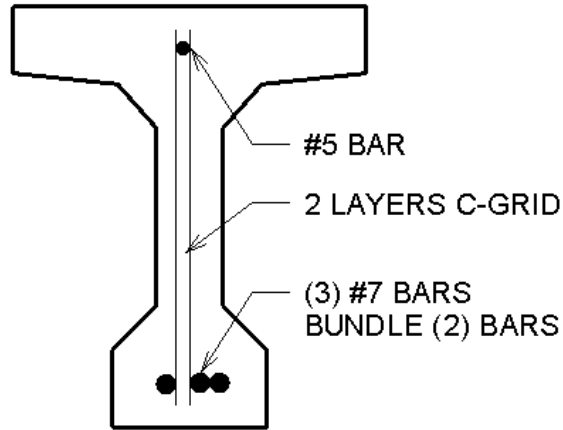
Cross-Section of Specimen 4 Two Layers C-Grid Spaced
